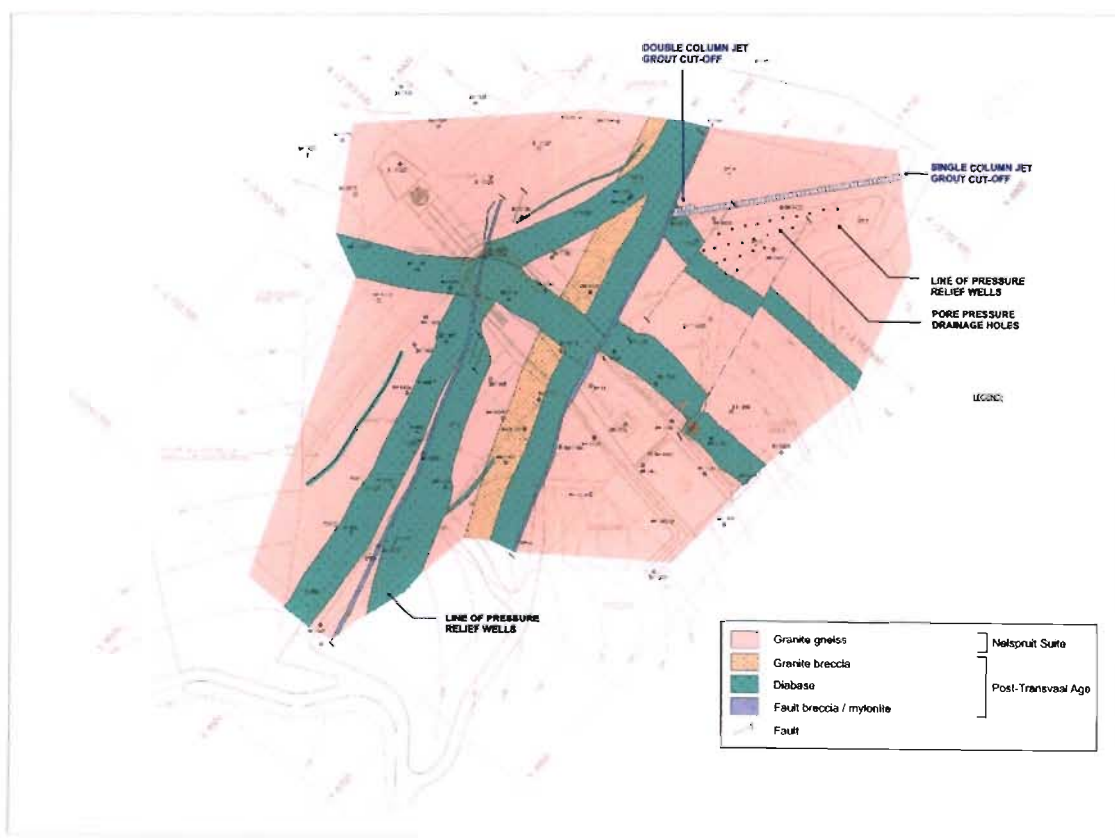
Layout of jet grout curtain and pressure relief wells at Injaka dam.
